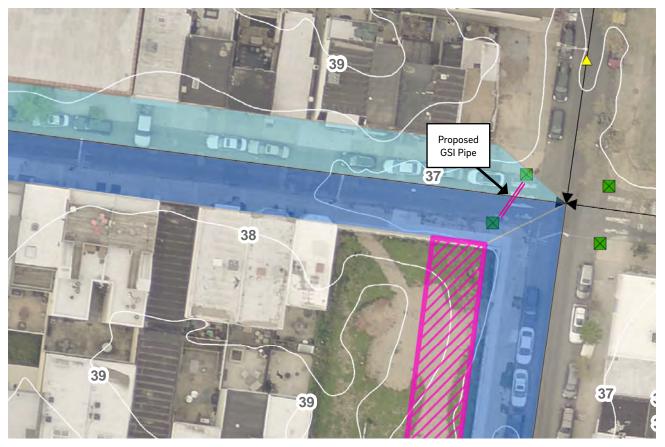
This example shows how a street crossing can be utilized to manage a non-adjacent drainage area.
